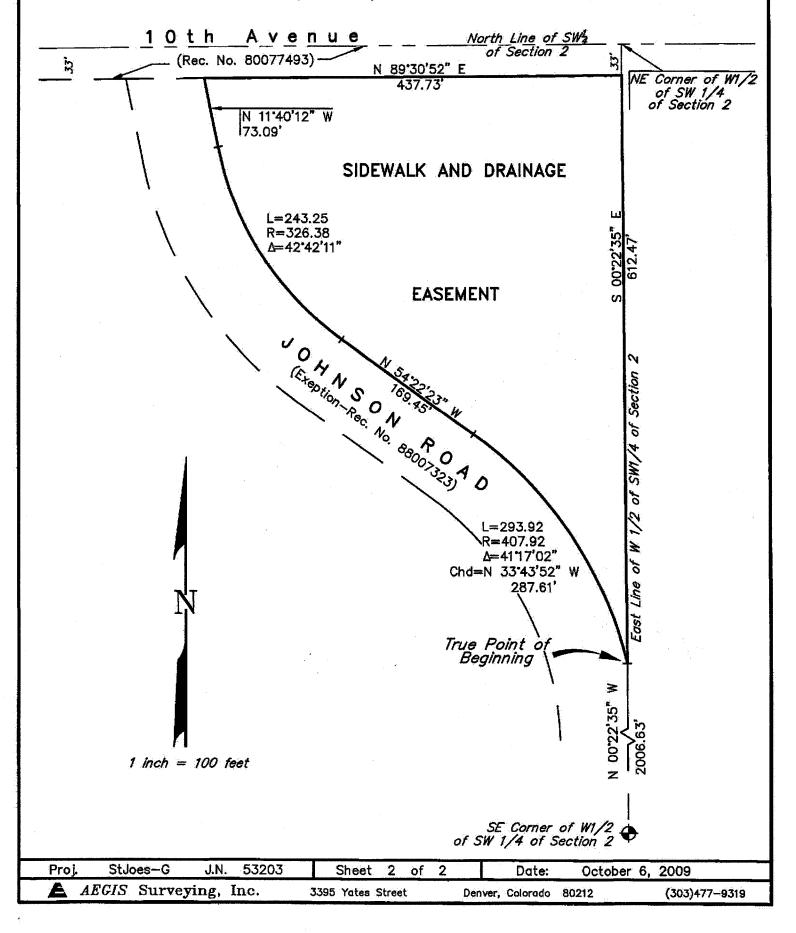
EXHIBIT A LEGAL DESCRIPTION SIDEWALK AND DRAINAGE EASEMENT A Portion of the West 1/2 of the Southwest 1/4 of Section 2, T. 4 S., R. 70 W. of the 6th P.M.
